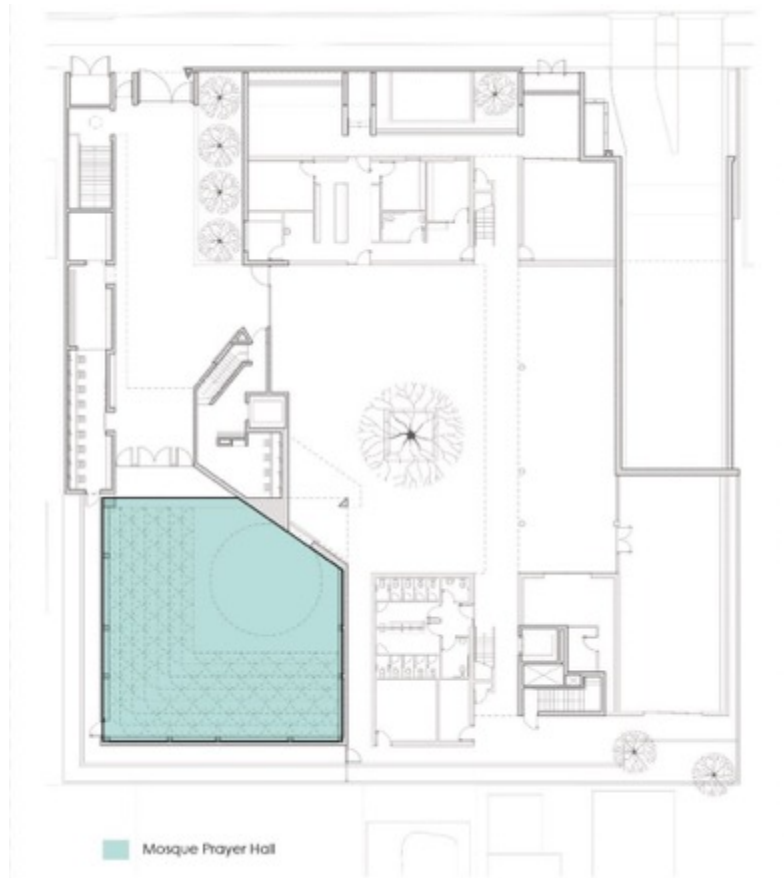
Punchbowl Mosque (marked in green by the author) and Site Ground Floor Plan (Archdaily 2022)
